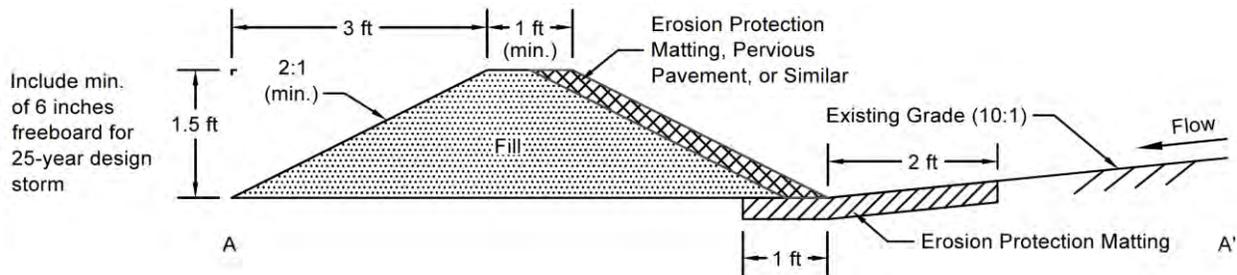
Proposed Diversion Berm Concept Design Cross Section
